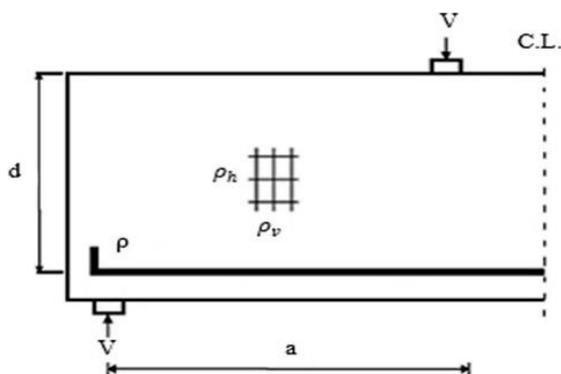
Geometric dimensions of a reinforced concrete deep beam
